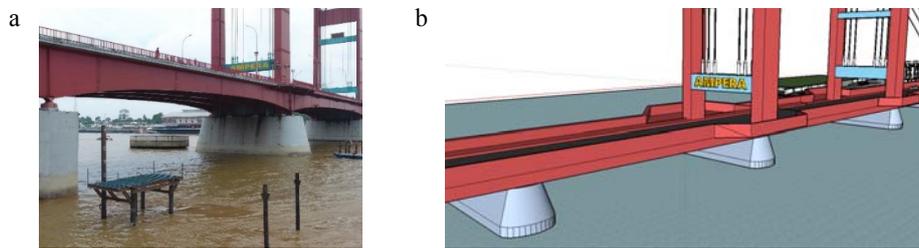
Ampera Bridge pier: a – real condition, b – 3D modelling
